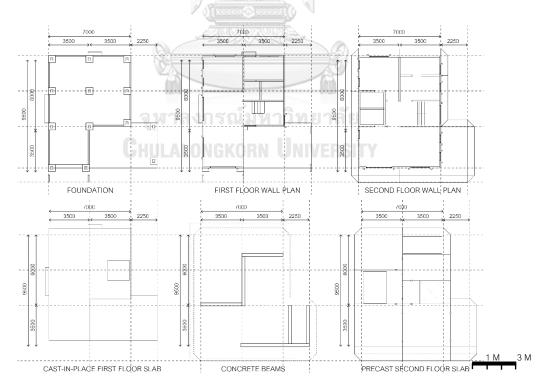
Proposed design module drawing of a A3 unit foundation, floor slabs and precast concrete wall plan.
